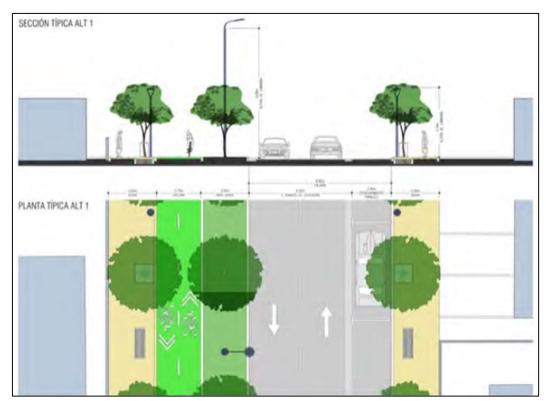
Detail of Street Section with Lamp Posts – ROSSILUGO ARCHITECTURE
